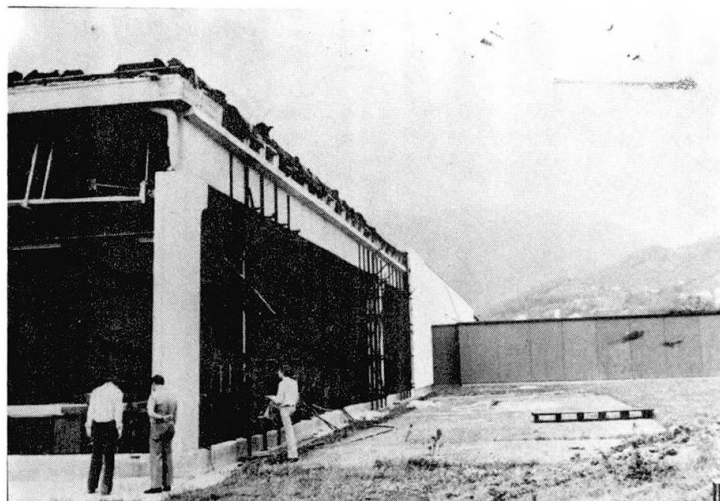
Prefabricated factory shed near Artegna. Wall panels fallen out during the earthquake because of insufficient fixation.
